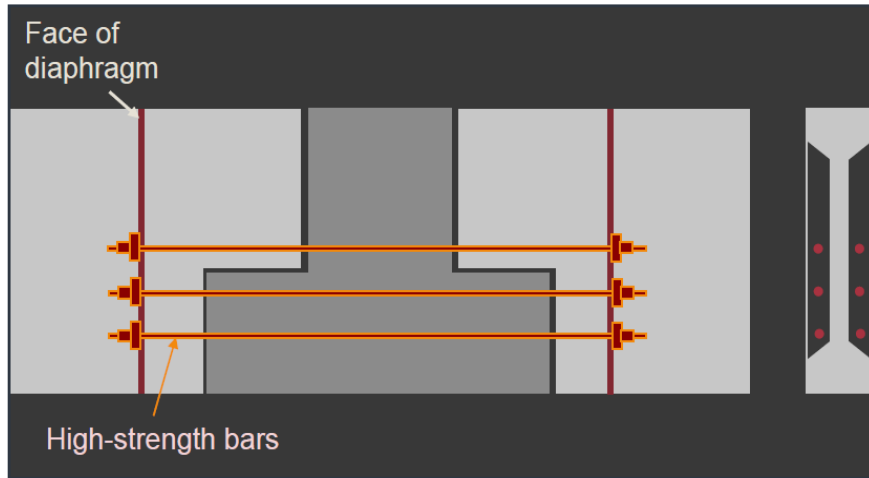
ISU superstructure/cap beam connection with high-strength bars
